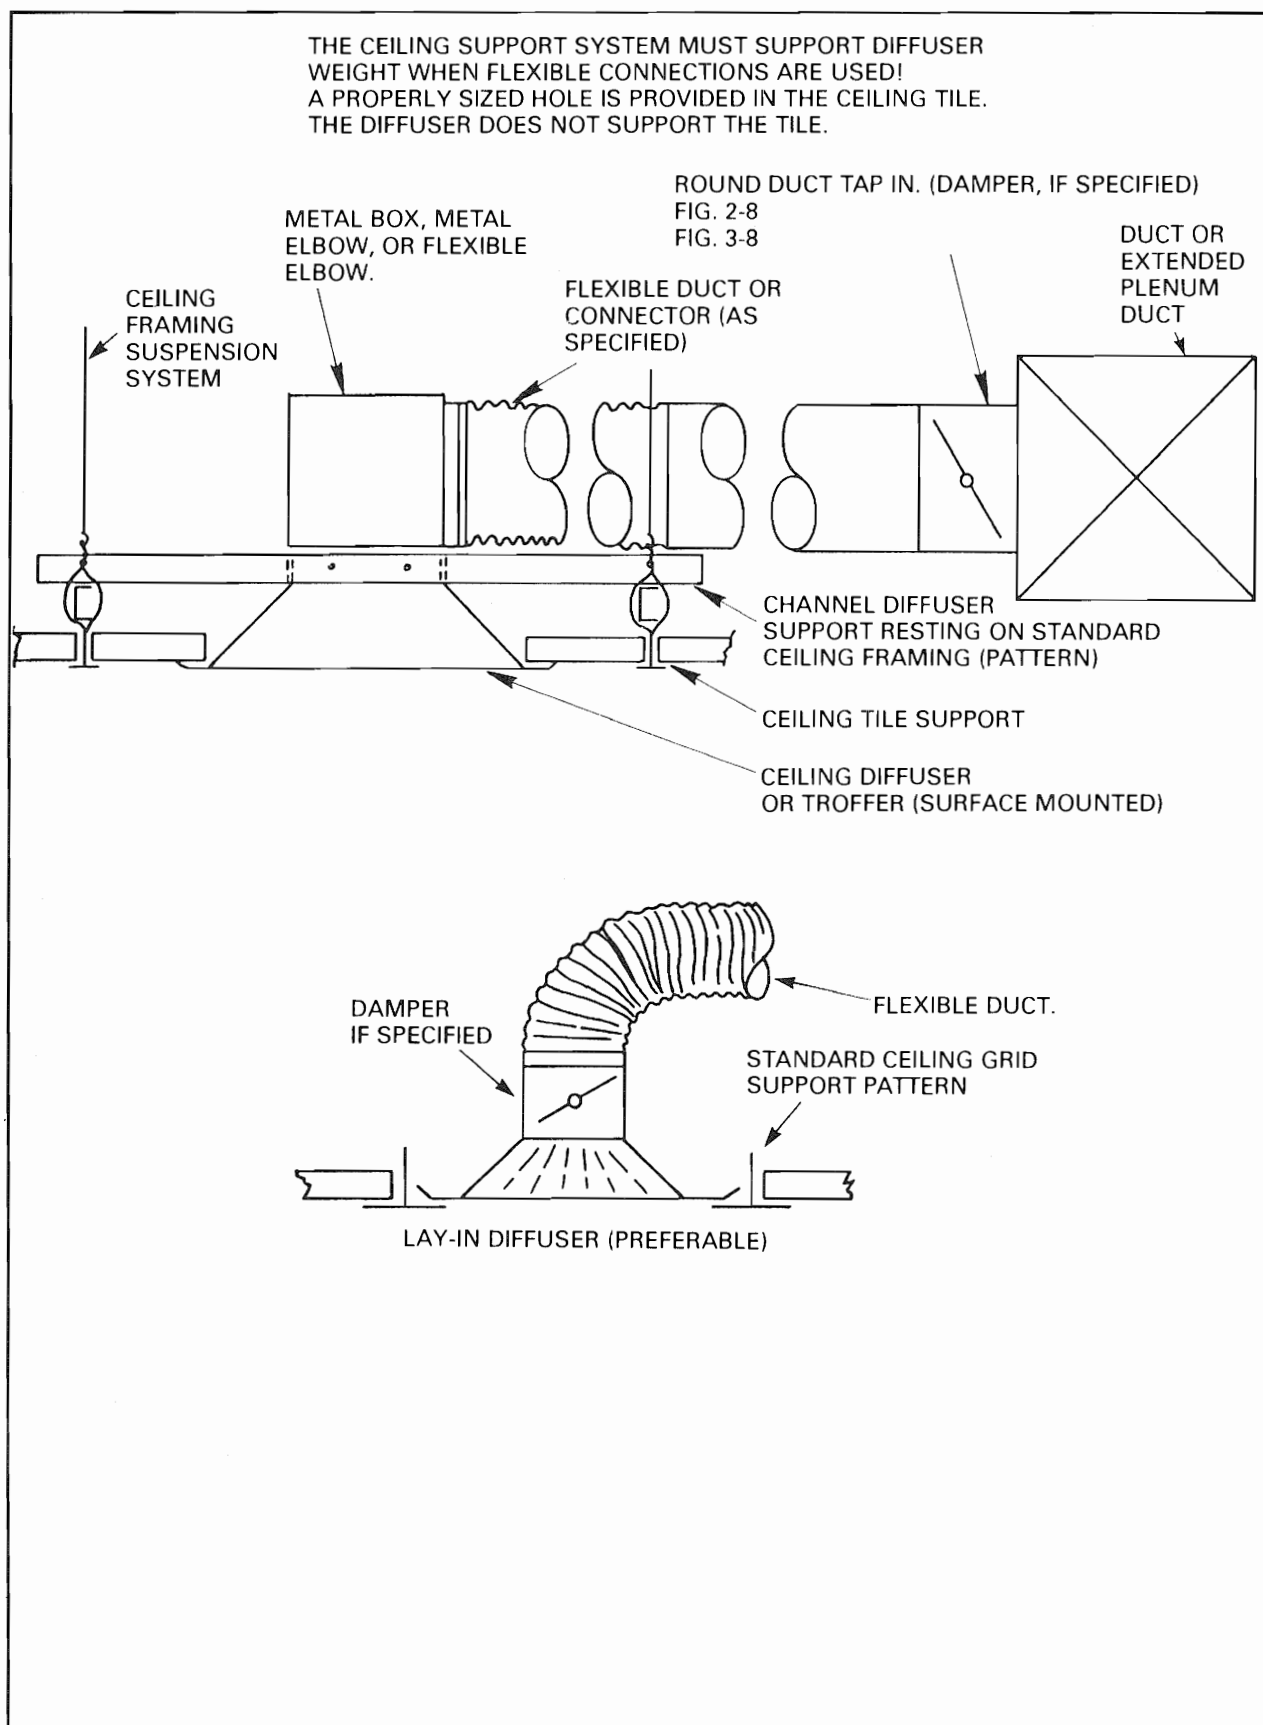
CEILING DIFFUSER BRANCH DUCTS
